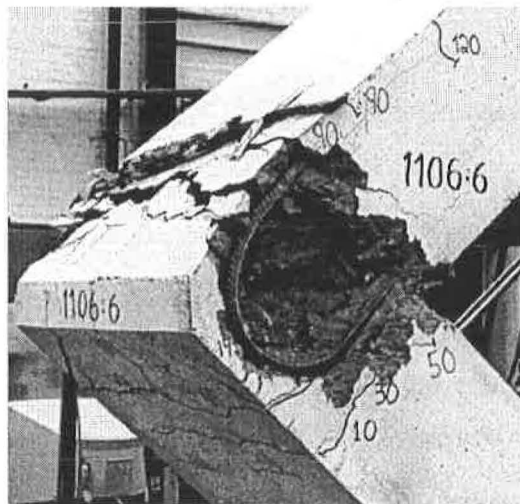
Spalling of the concrete cover using reinforcement loops. From Johansson (1996).
